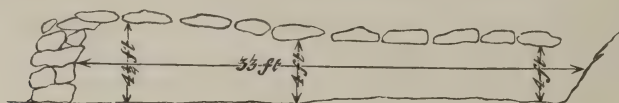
Elevation of underground Structure at Eriboll, Sutherlandshire.
